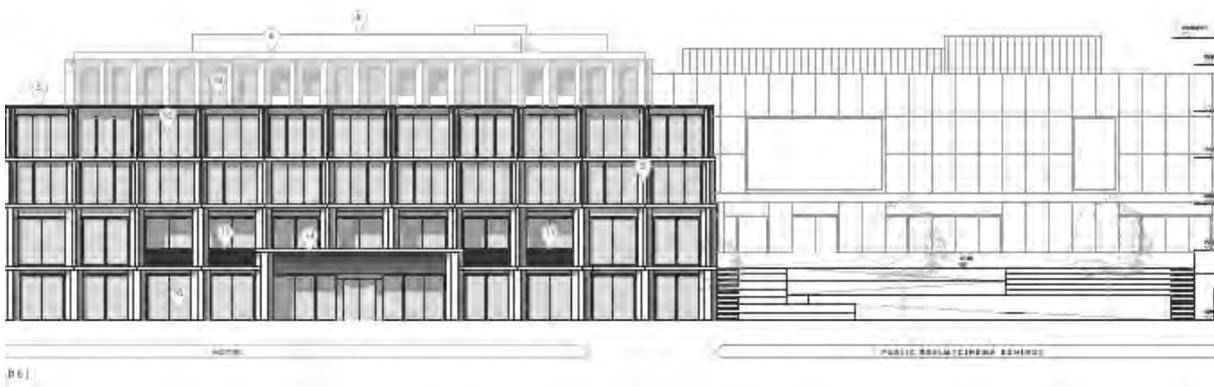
Original proposed Queen’s Parade elevation showing roof plant on hotel and cinema buildings prior to amendments
